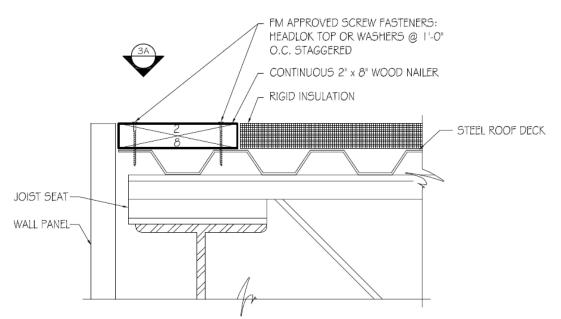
ROOF EDGE WOOD BLOCKING - SCREW FASTENER ANCHORAGE
